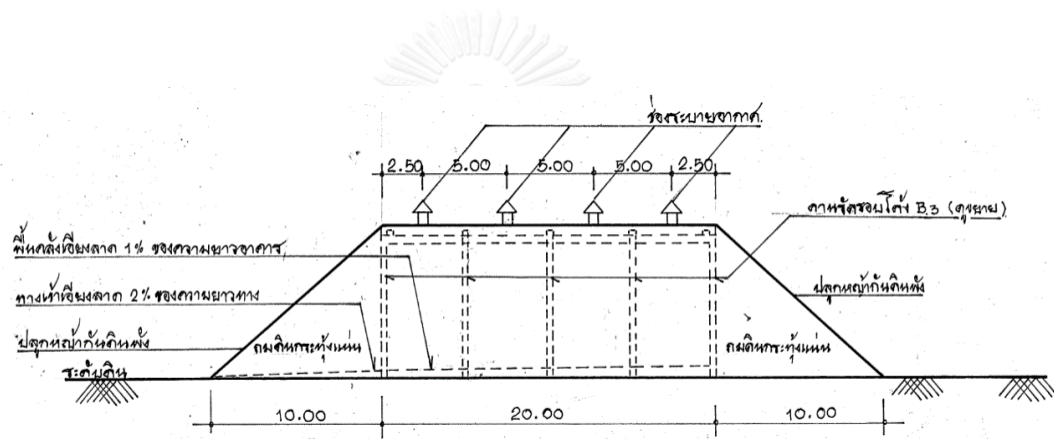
Construction drawings of the existing Ammunition storage in Thailand
